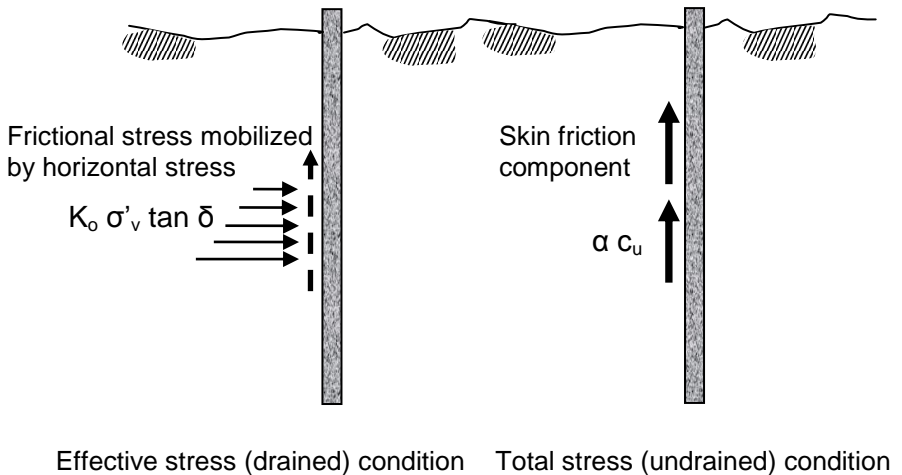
Schematic of pile foundation and components of frictional load capacity for drained and undrained conditions.
